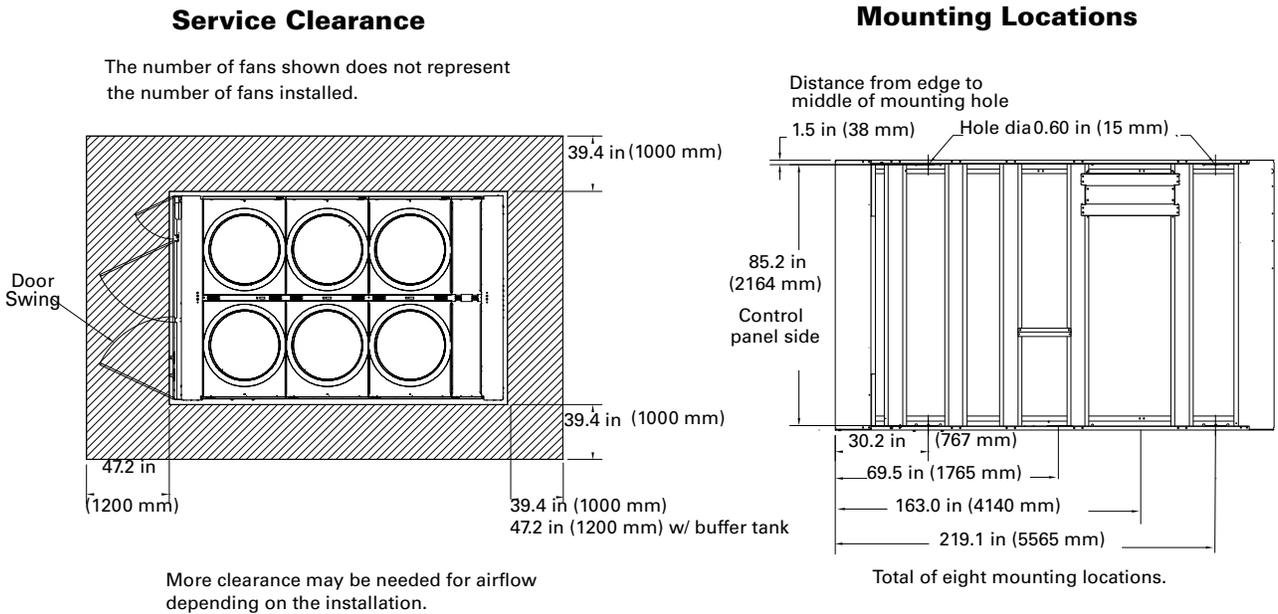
CGAM 140 (comprehensive acoustic package version), 150 and 160 - pump package, buffer tank
